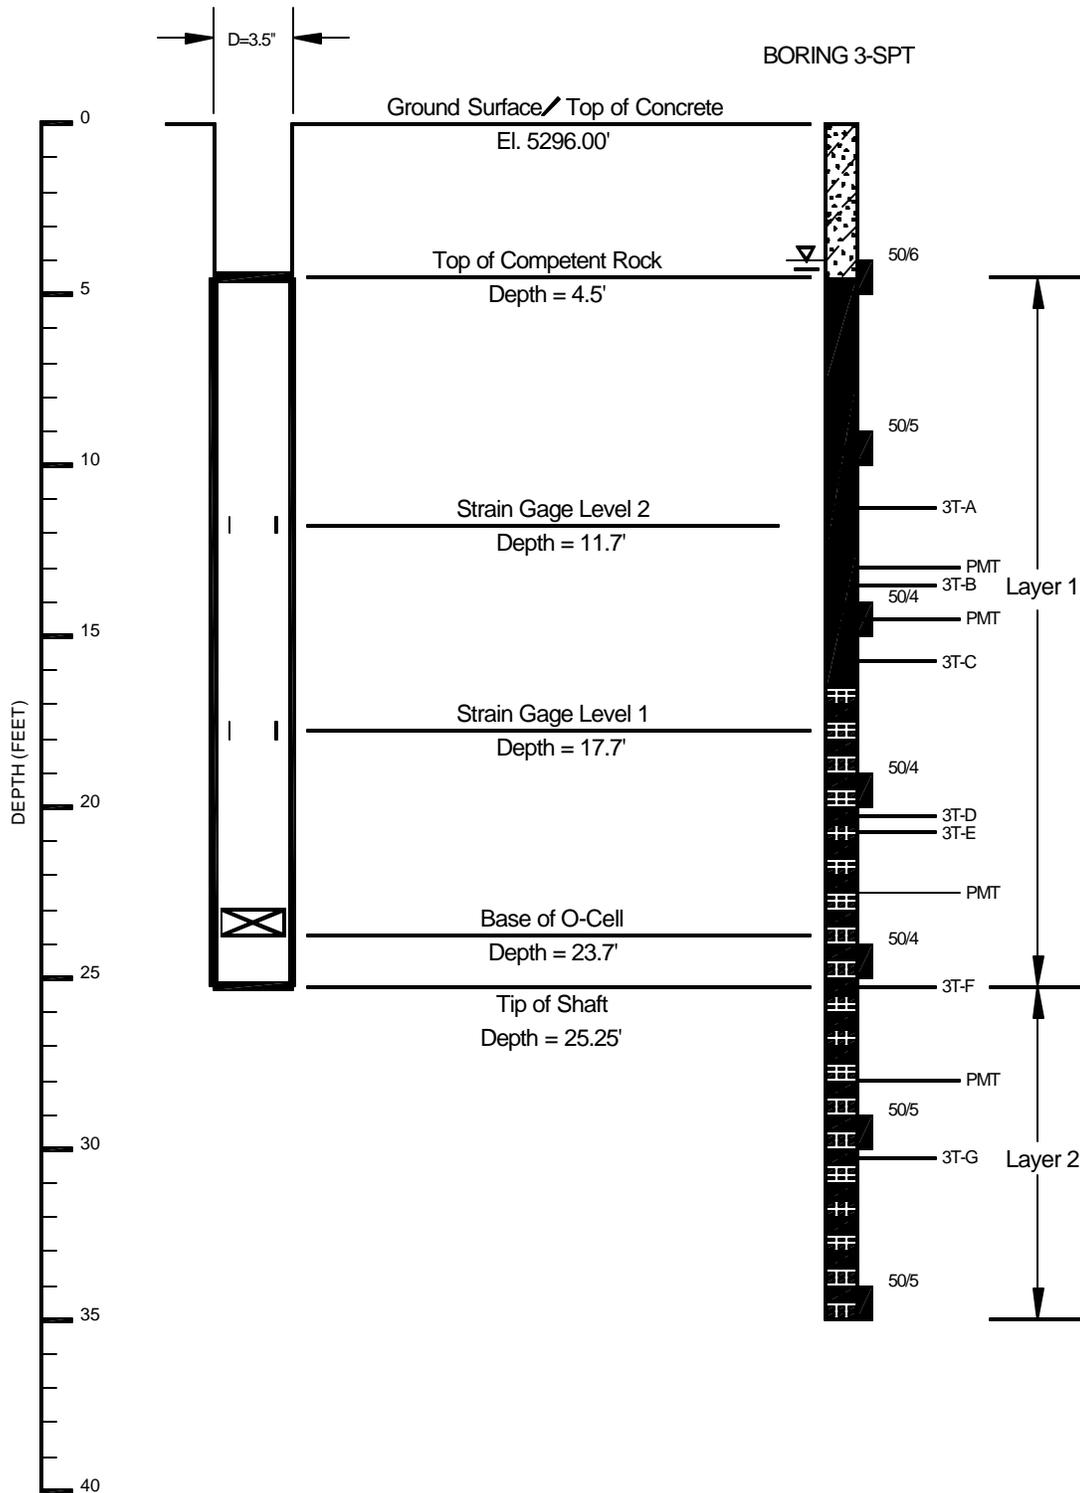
Instrumented Test Shaft Schematic and Boring Logs for Franklin Site
